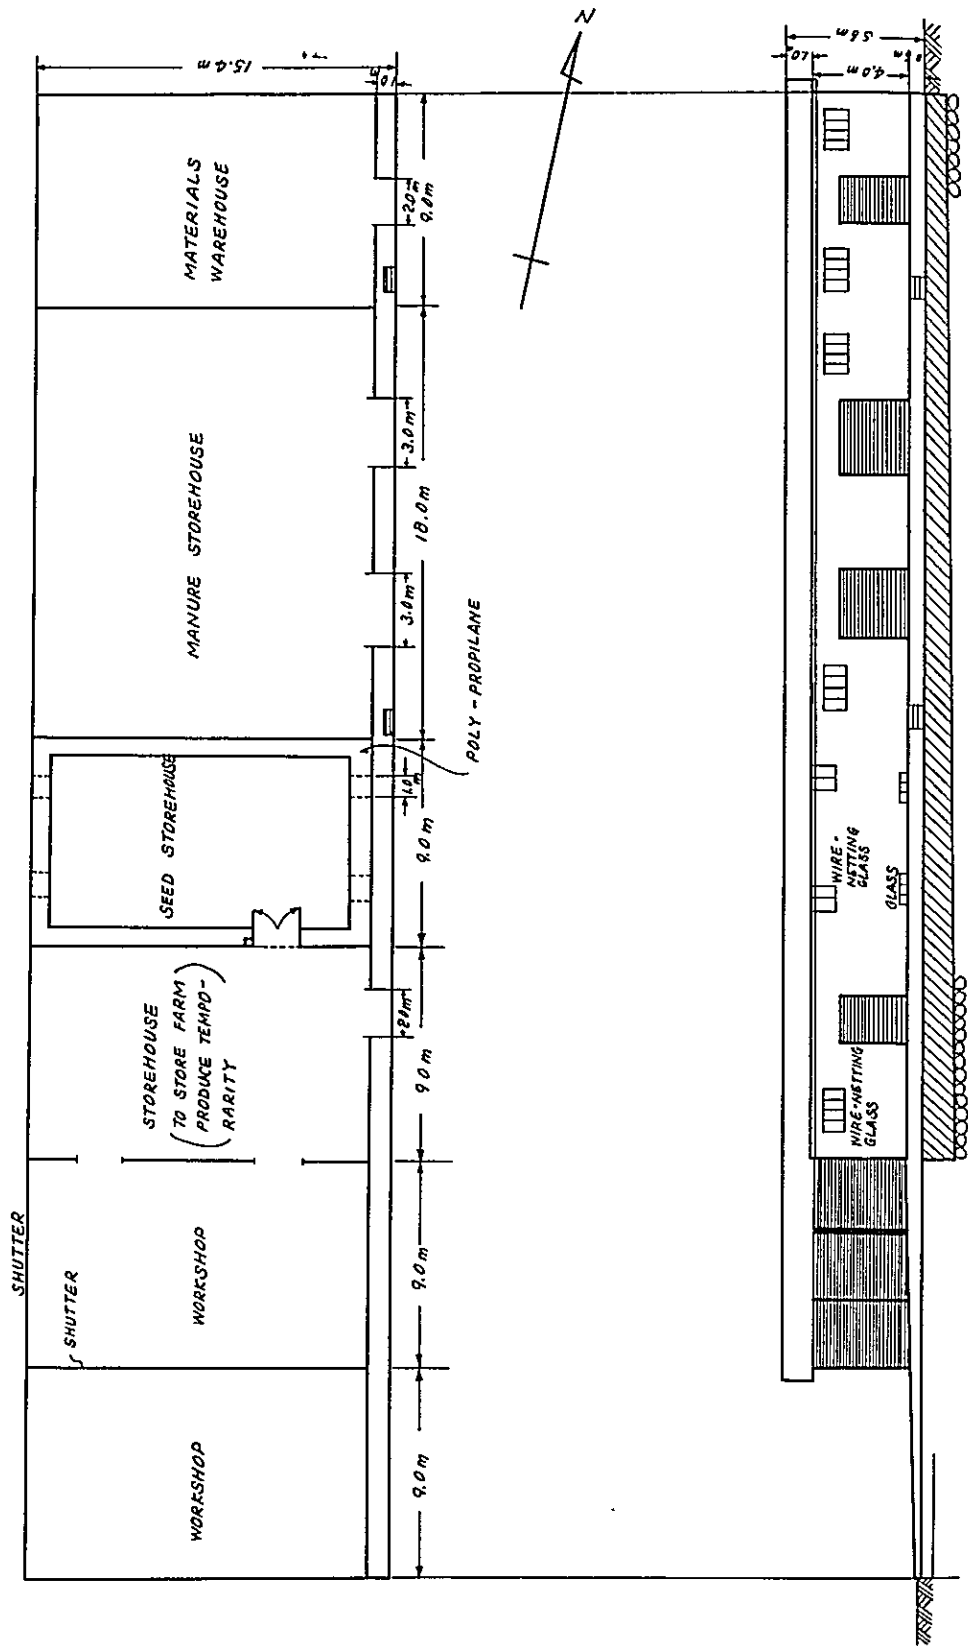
LAYOUT OF WAREHOUSE
